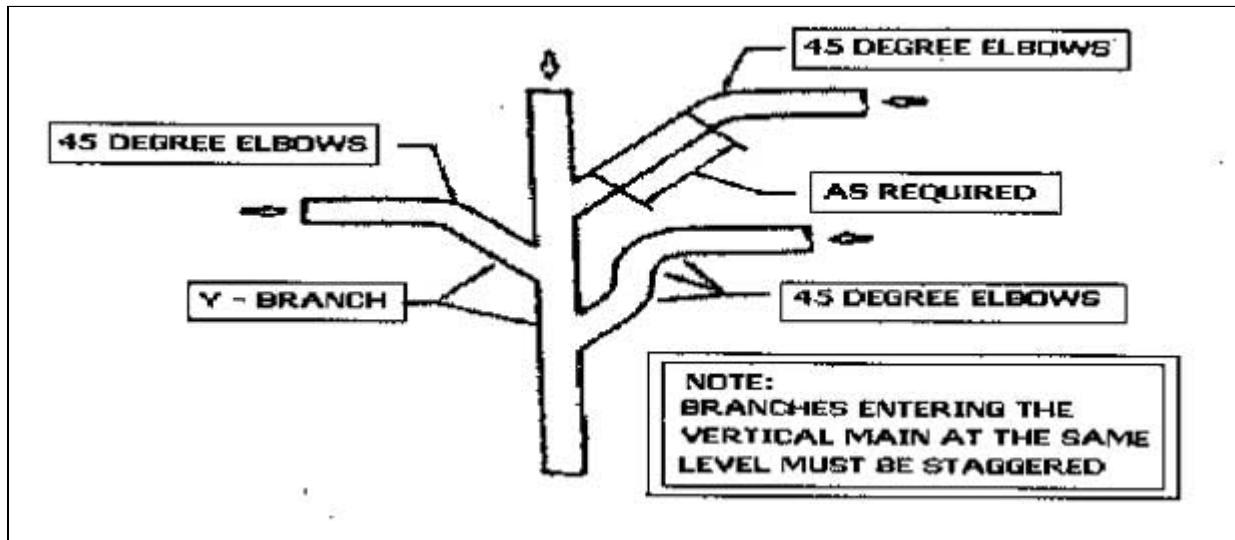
VERTICAL DROP TO HORIZONTAL CONNECTION
